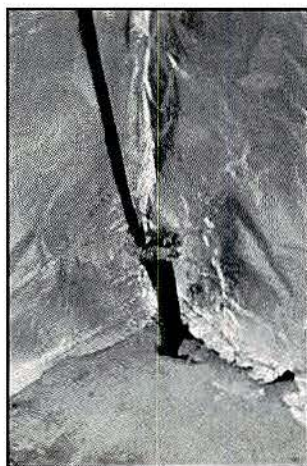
A hole is drilled through the concrete floor at the northeast junction, and a 4-foot-long, 5/8-inch-diameter copper ground rod is driven into the underlying soil for an earth ground connection.
